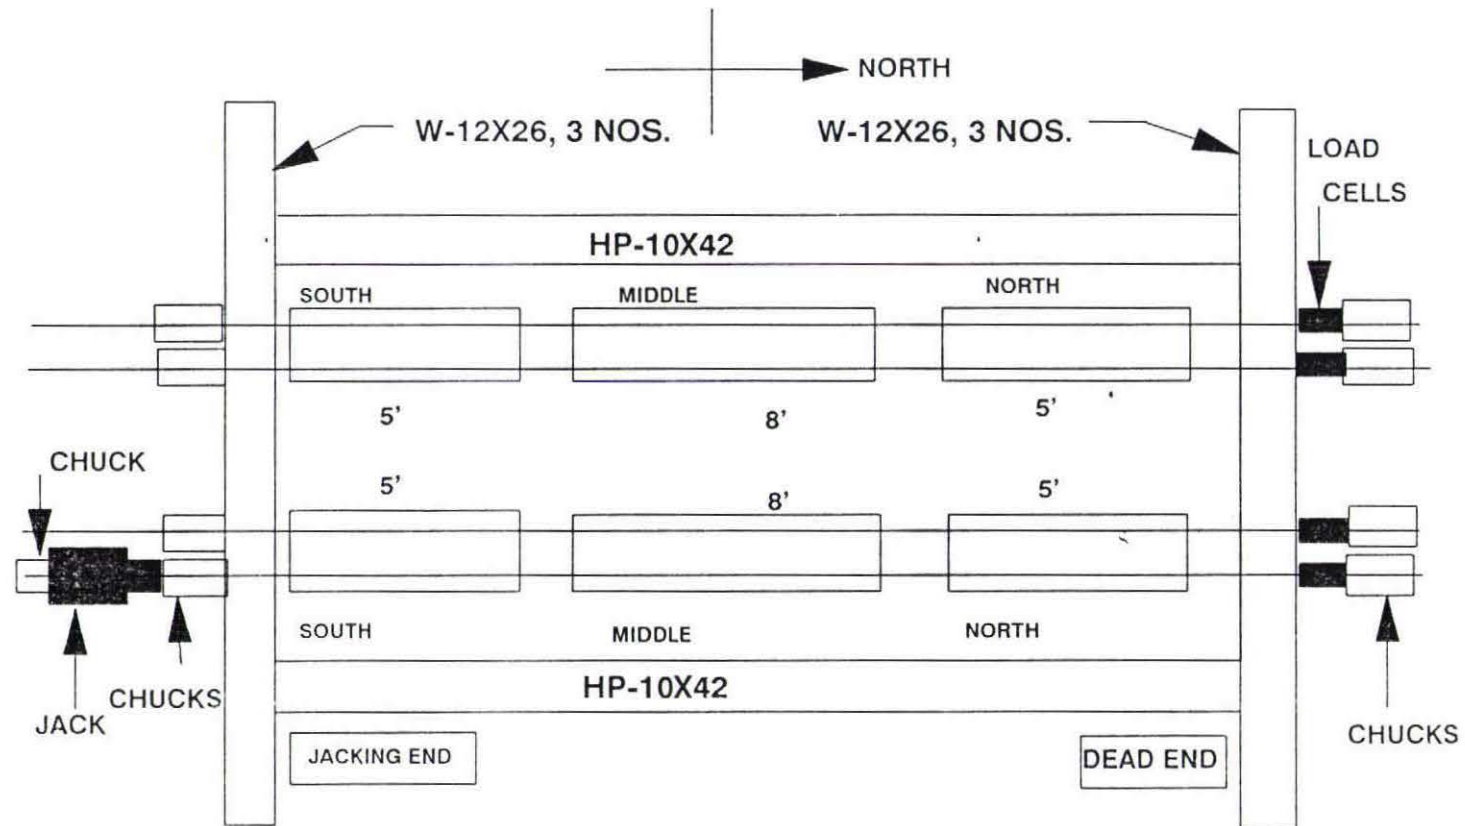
THE PRESTRESSING BED USED FOR PRESTRESSING CABLES
